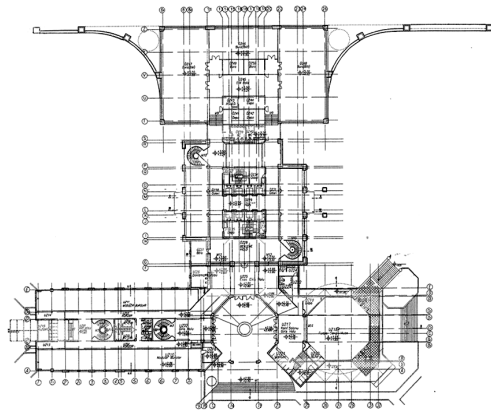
Entrance floor plan of the second project (Source: Sute Architectural Office Archive)
